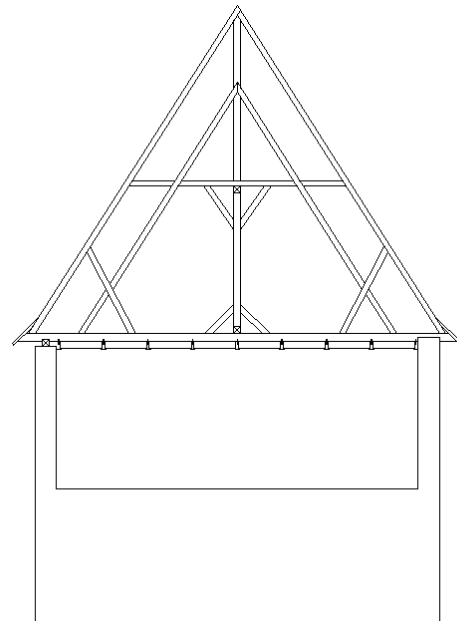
Removal of polystyrene, shoring and transverse beam.
